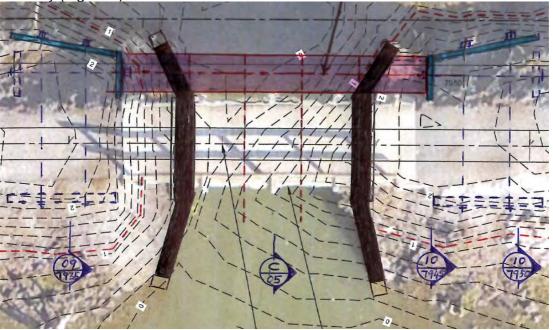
Plan view of cycleway clip on and rail bridge 11 BOIVR. Cycleway is highlighted pink.
